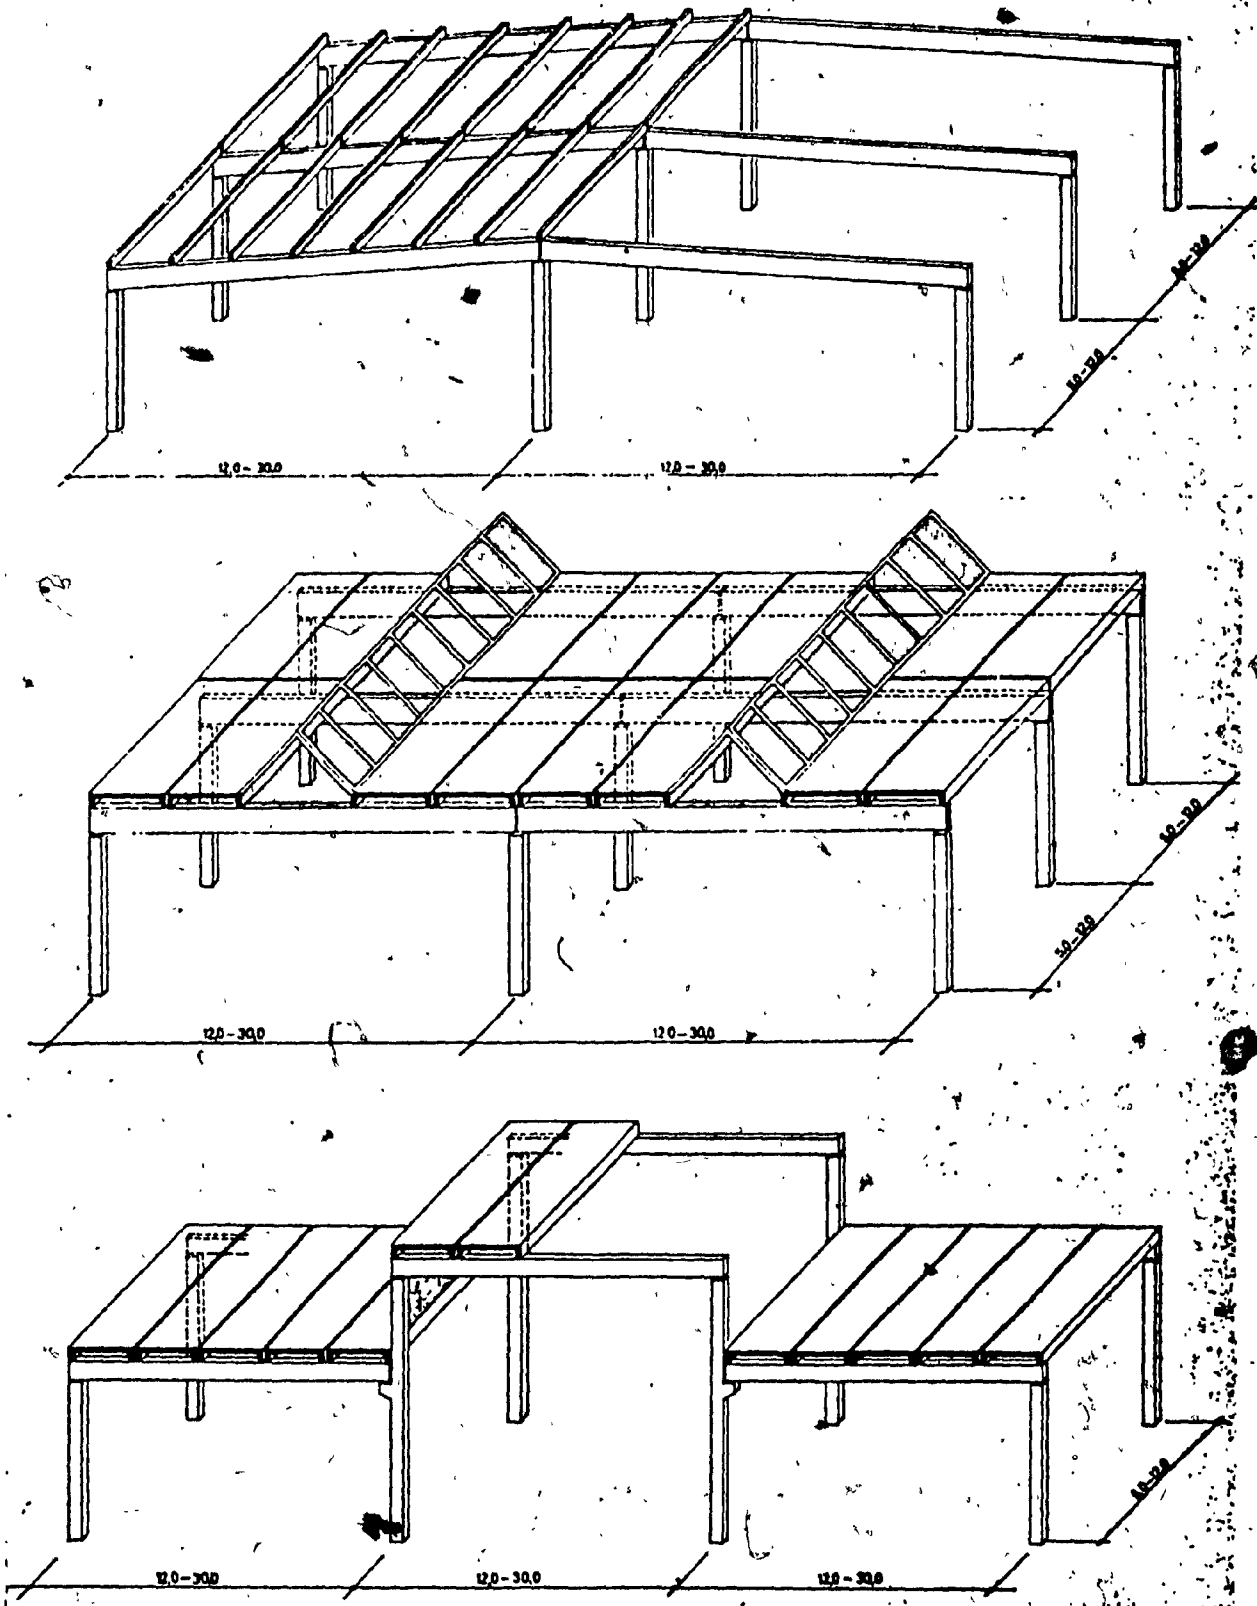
Shed Type Structure - Framed Construction (K-21)
